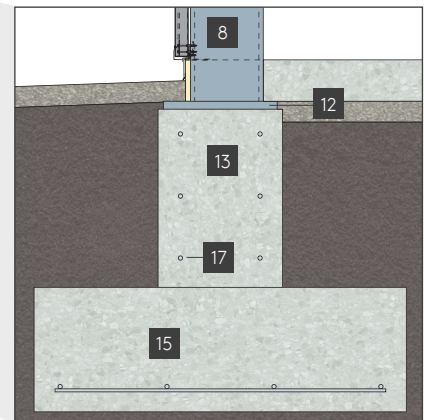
Structural bay and foundation detail of the building using the Kingspan QuadCore® IMP.
